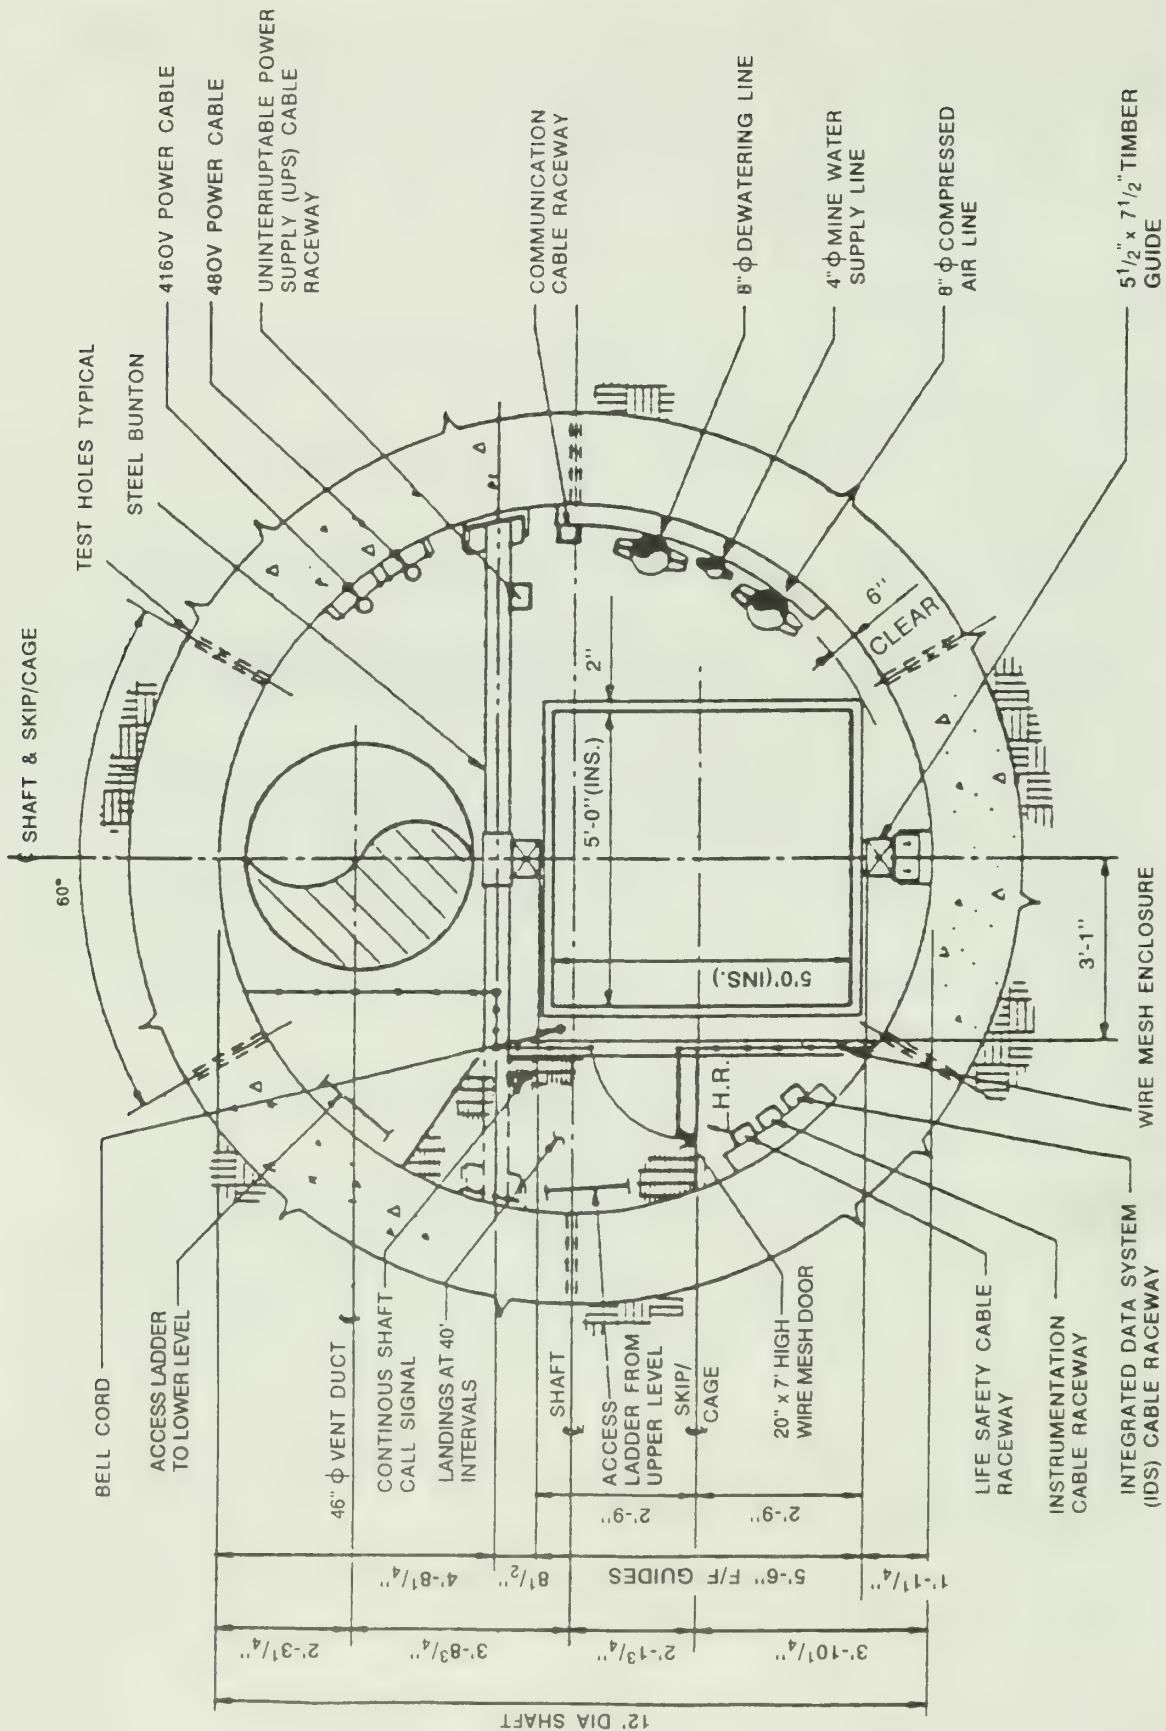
General arrangement of internal structures of exploratory shaft 1. Modified from Title I design package (DOE, 1988).
